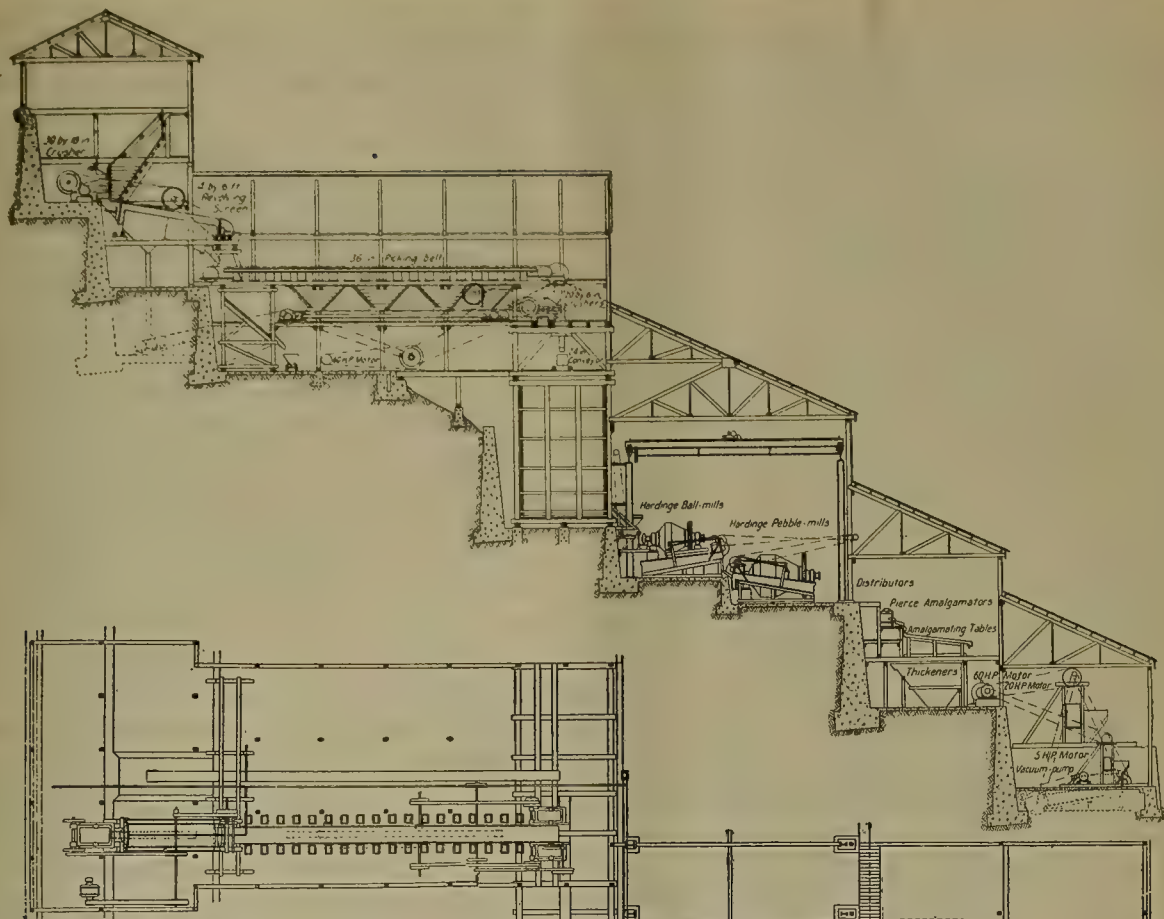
PLAN AND SECTIONAL ELEVATION OF THE TUL MI CHUNG REDUCTION PLANT
